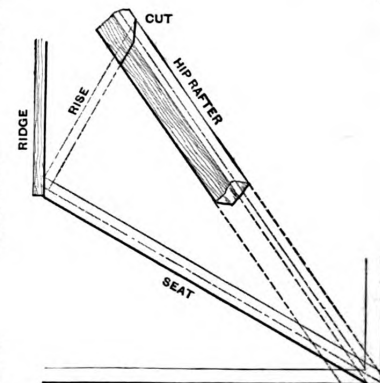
Method Suggested by "J. J." as Applicable to all Cases of Ground Plan.
